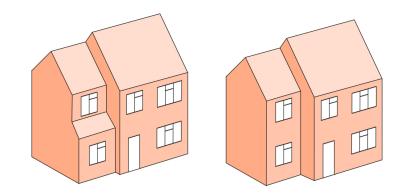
Side extensions should be set back by 1 m from the front of the house and the ridge lowered to avoid a 'terracing effect'.
